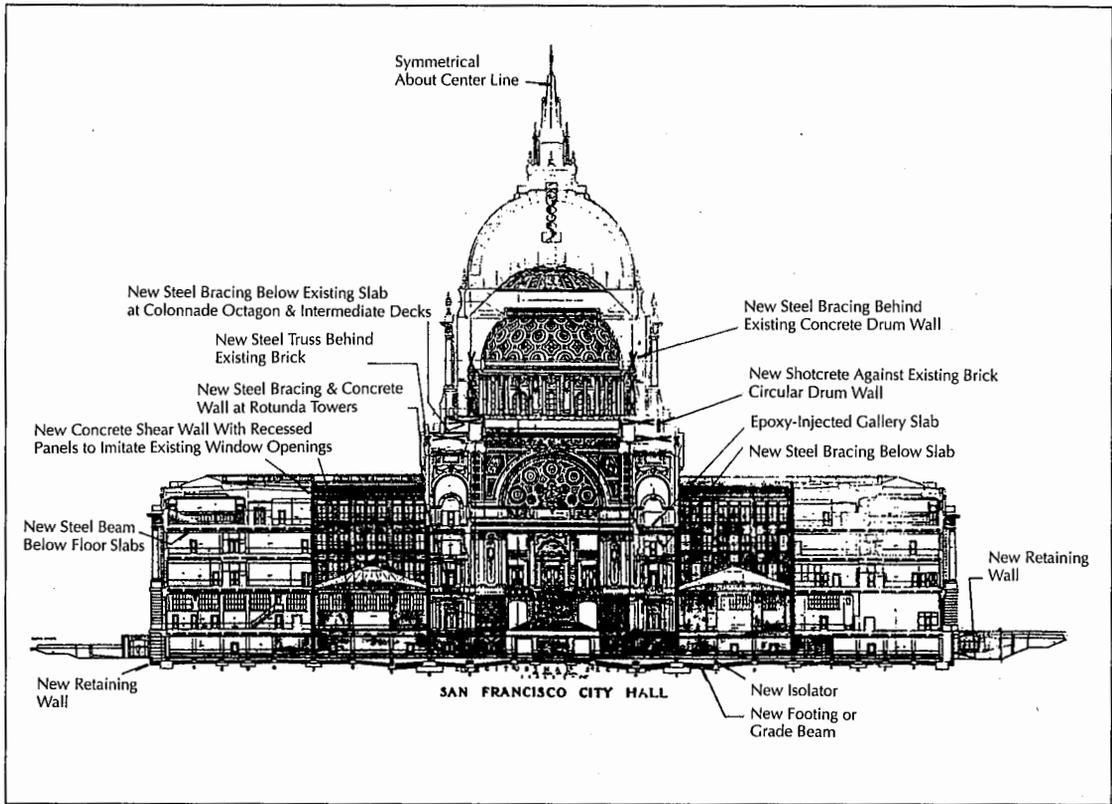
Longitudinal building section of San Francisco City Hall showing the base-isolation scheme.
